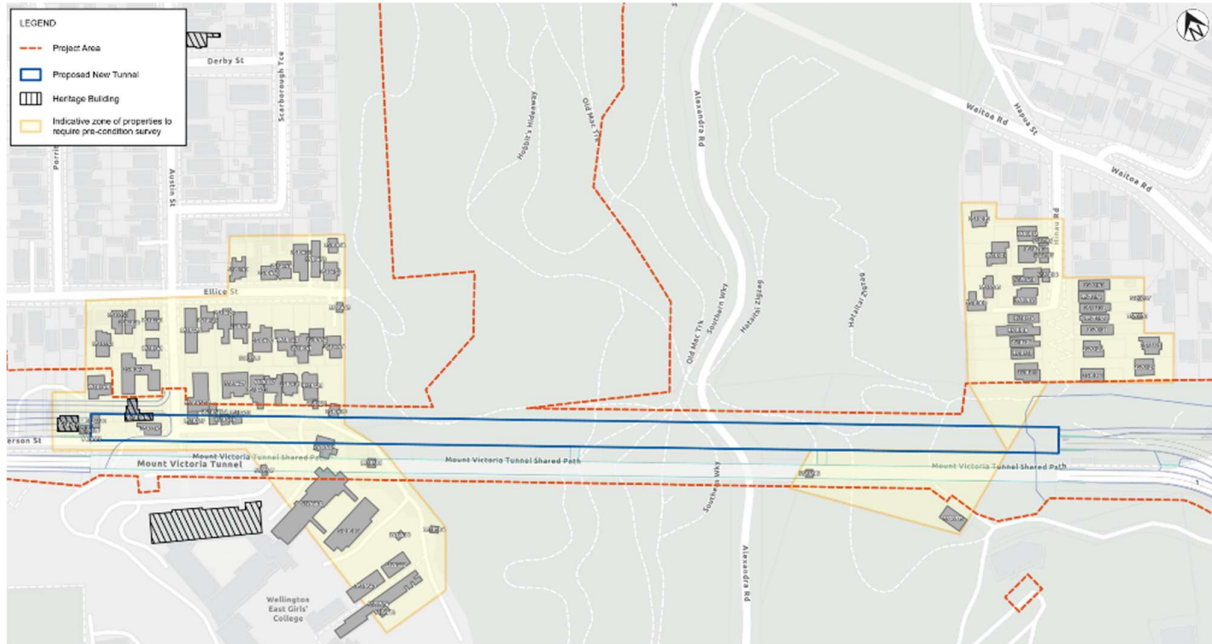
Area of potential subsidence and heritage buildings at the Mt Vitoria tunnel area
